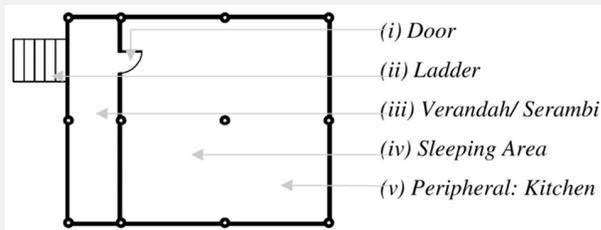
Bajau Laut Spatial Layout (Source: The Spatial Extensions of Traditional Coastal Sama-Bajau Houses. Ismail (2018))
